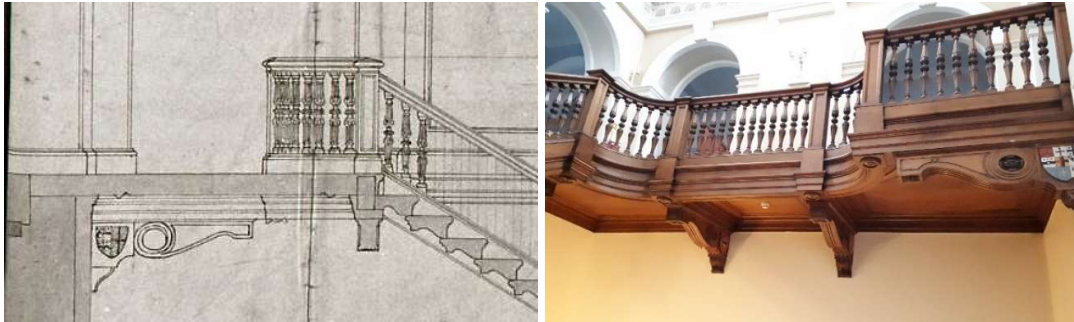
Detail of cantilevering balcony (left) and picture of balcony from stair below (right).
